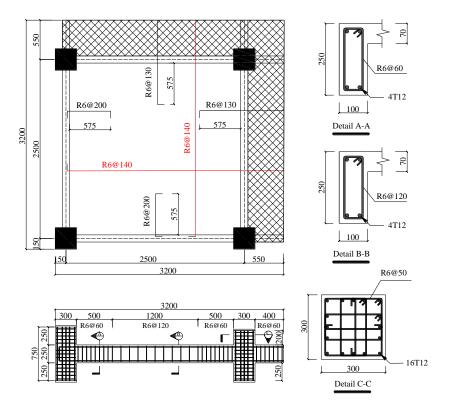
Dimensions and reinforcement detailing of Specimen US (unit: in mm) [7]
